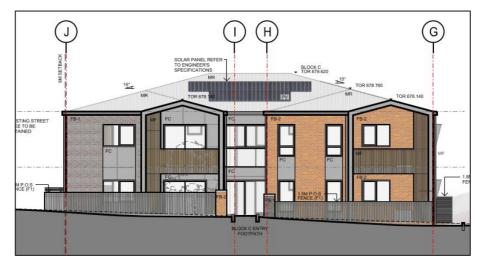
Extract from Architectural Plans – Sanita Street Block C Streetscape Perspective (Source: DEM (Aust), dated 23/08/2024)
